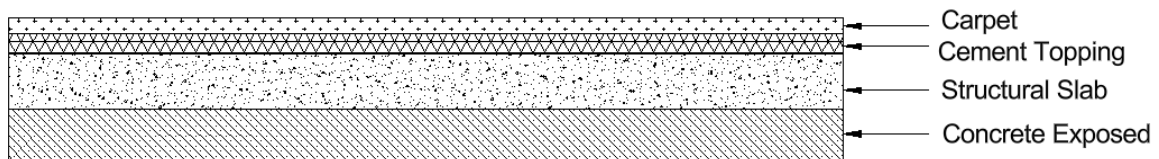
The Construction Design for the Montpetit Hall Semi-exposed Floor
